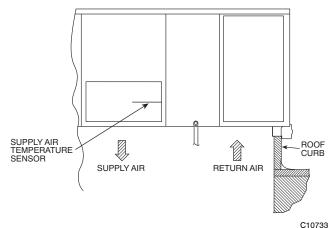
Mounting Location for Supply Air Temperature (SAT) Sensor on 50TC-D Units
